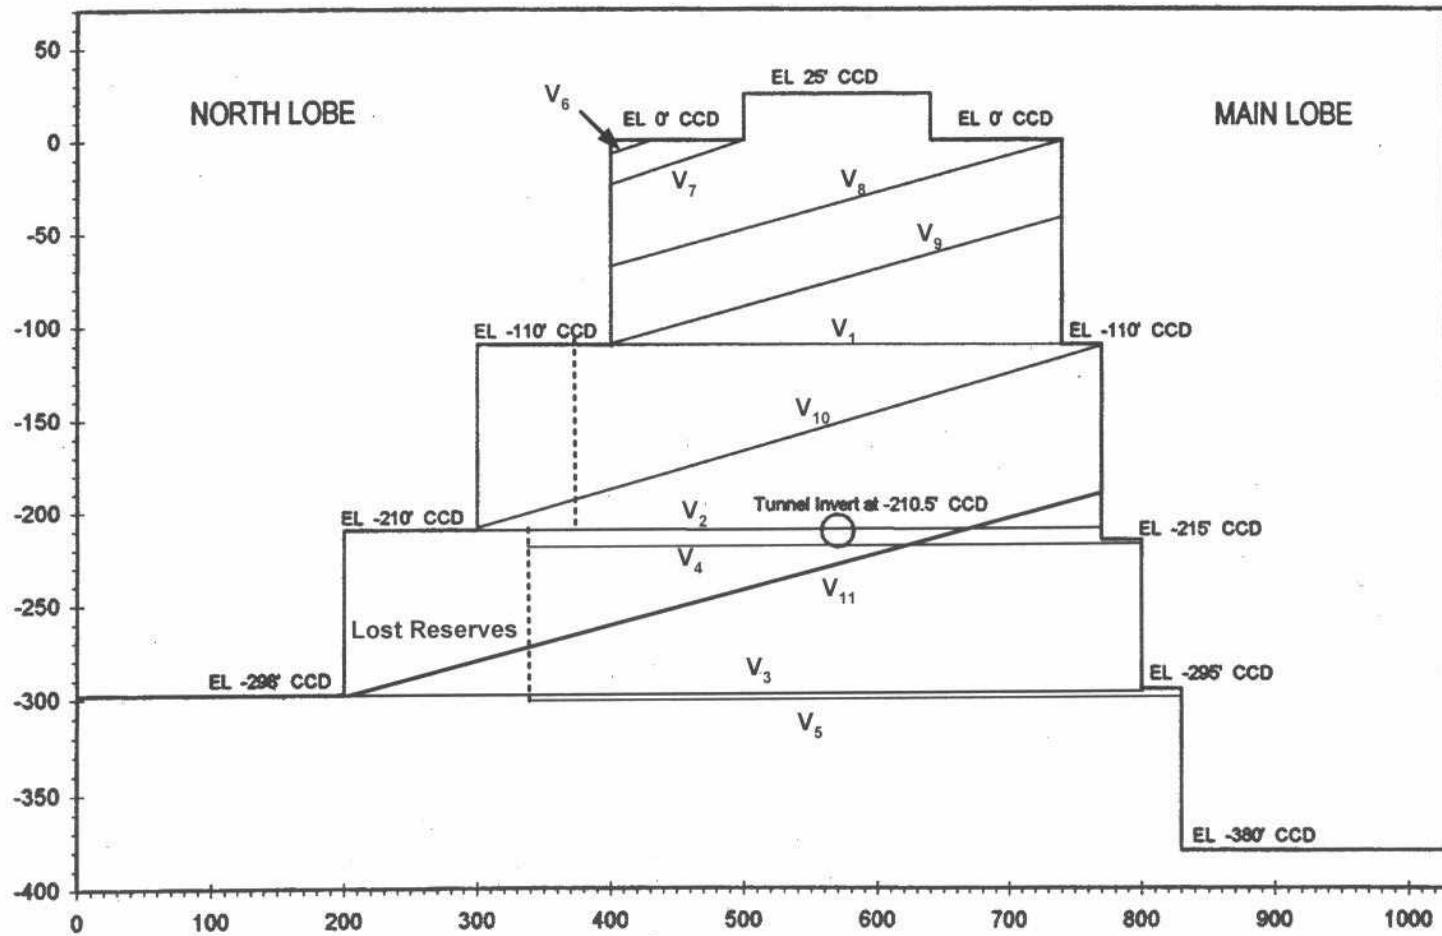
Cross Section of Rock Ridge Showing Potential Fracture Surfaces.
